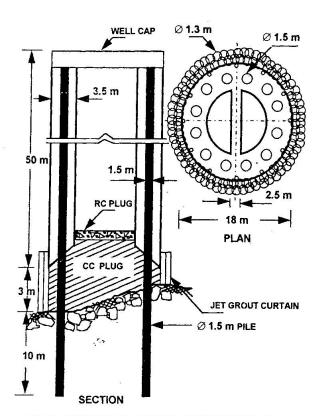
JOGIGHOPA BRIDGE FOUNDATIONS 17, 18
